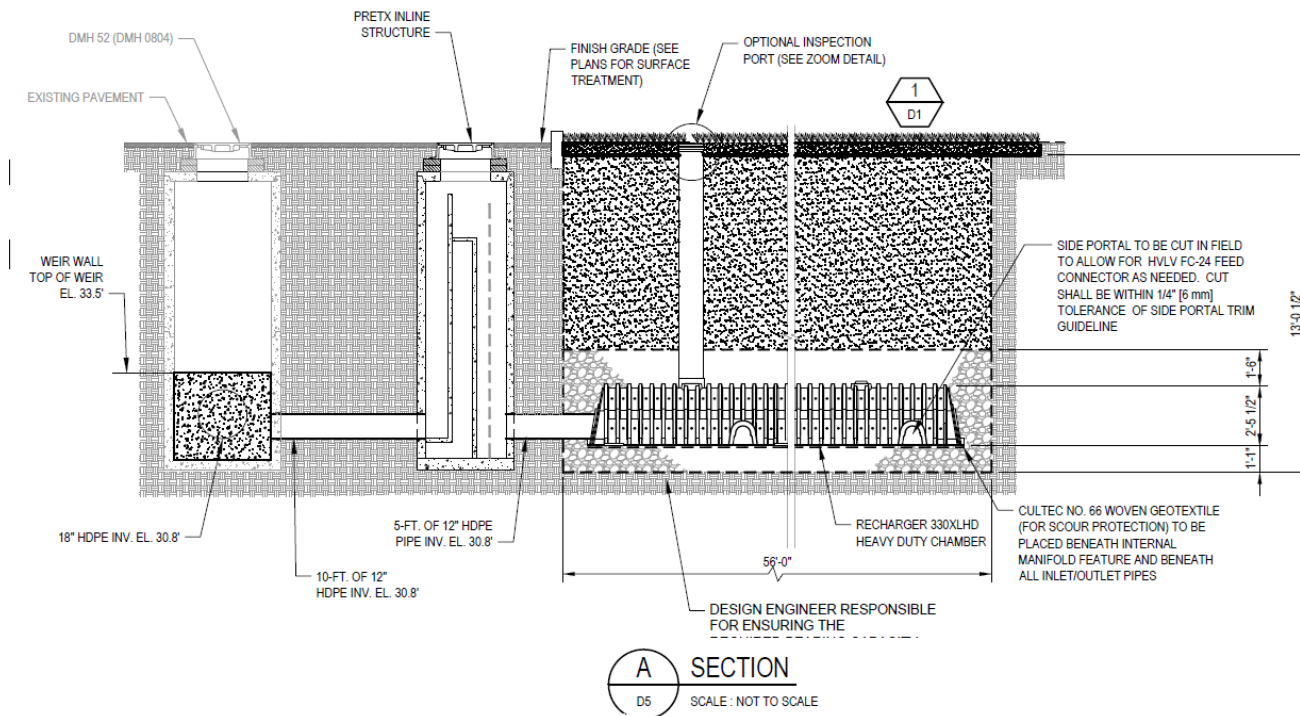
Engineering Section Detail for Front Street Subsurface Infiltration BMP 5
